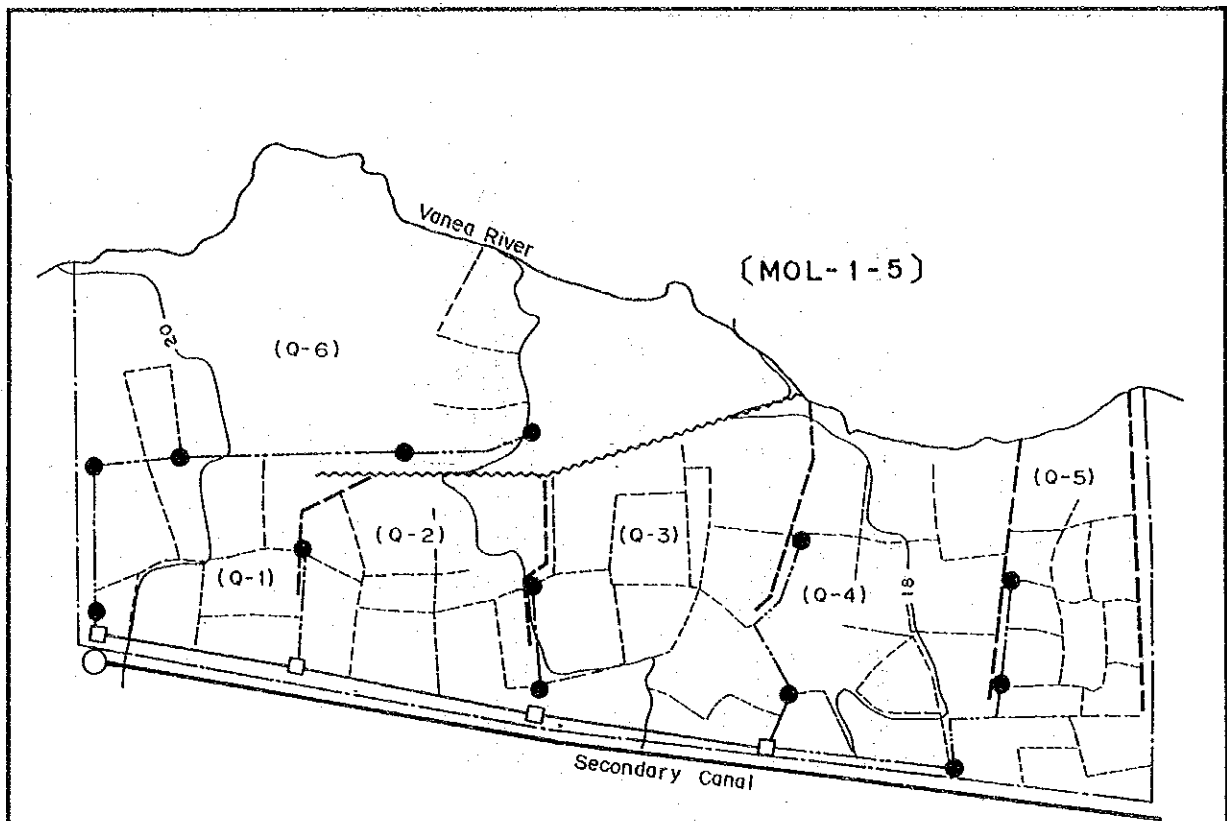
Typical Layout of On-farm Facilities (1/4)
